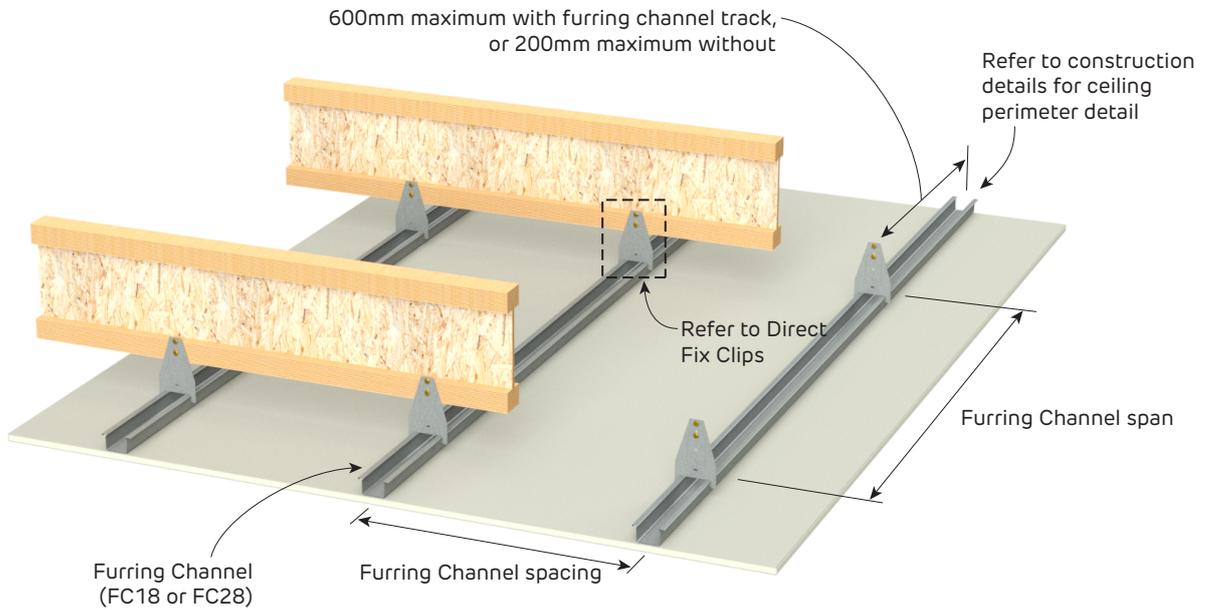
Direct Fix Furring Channel Ceiling Frame
